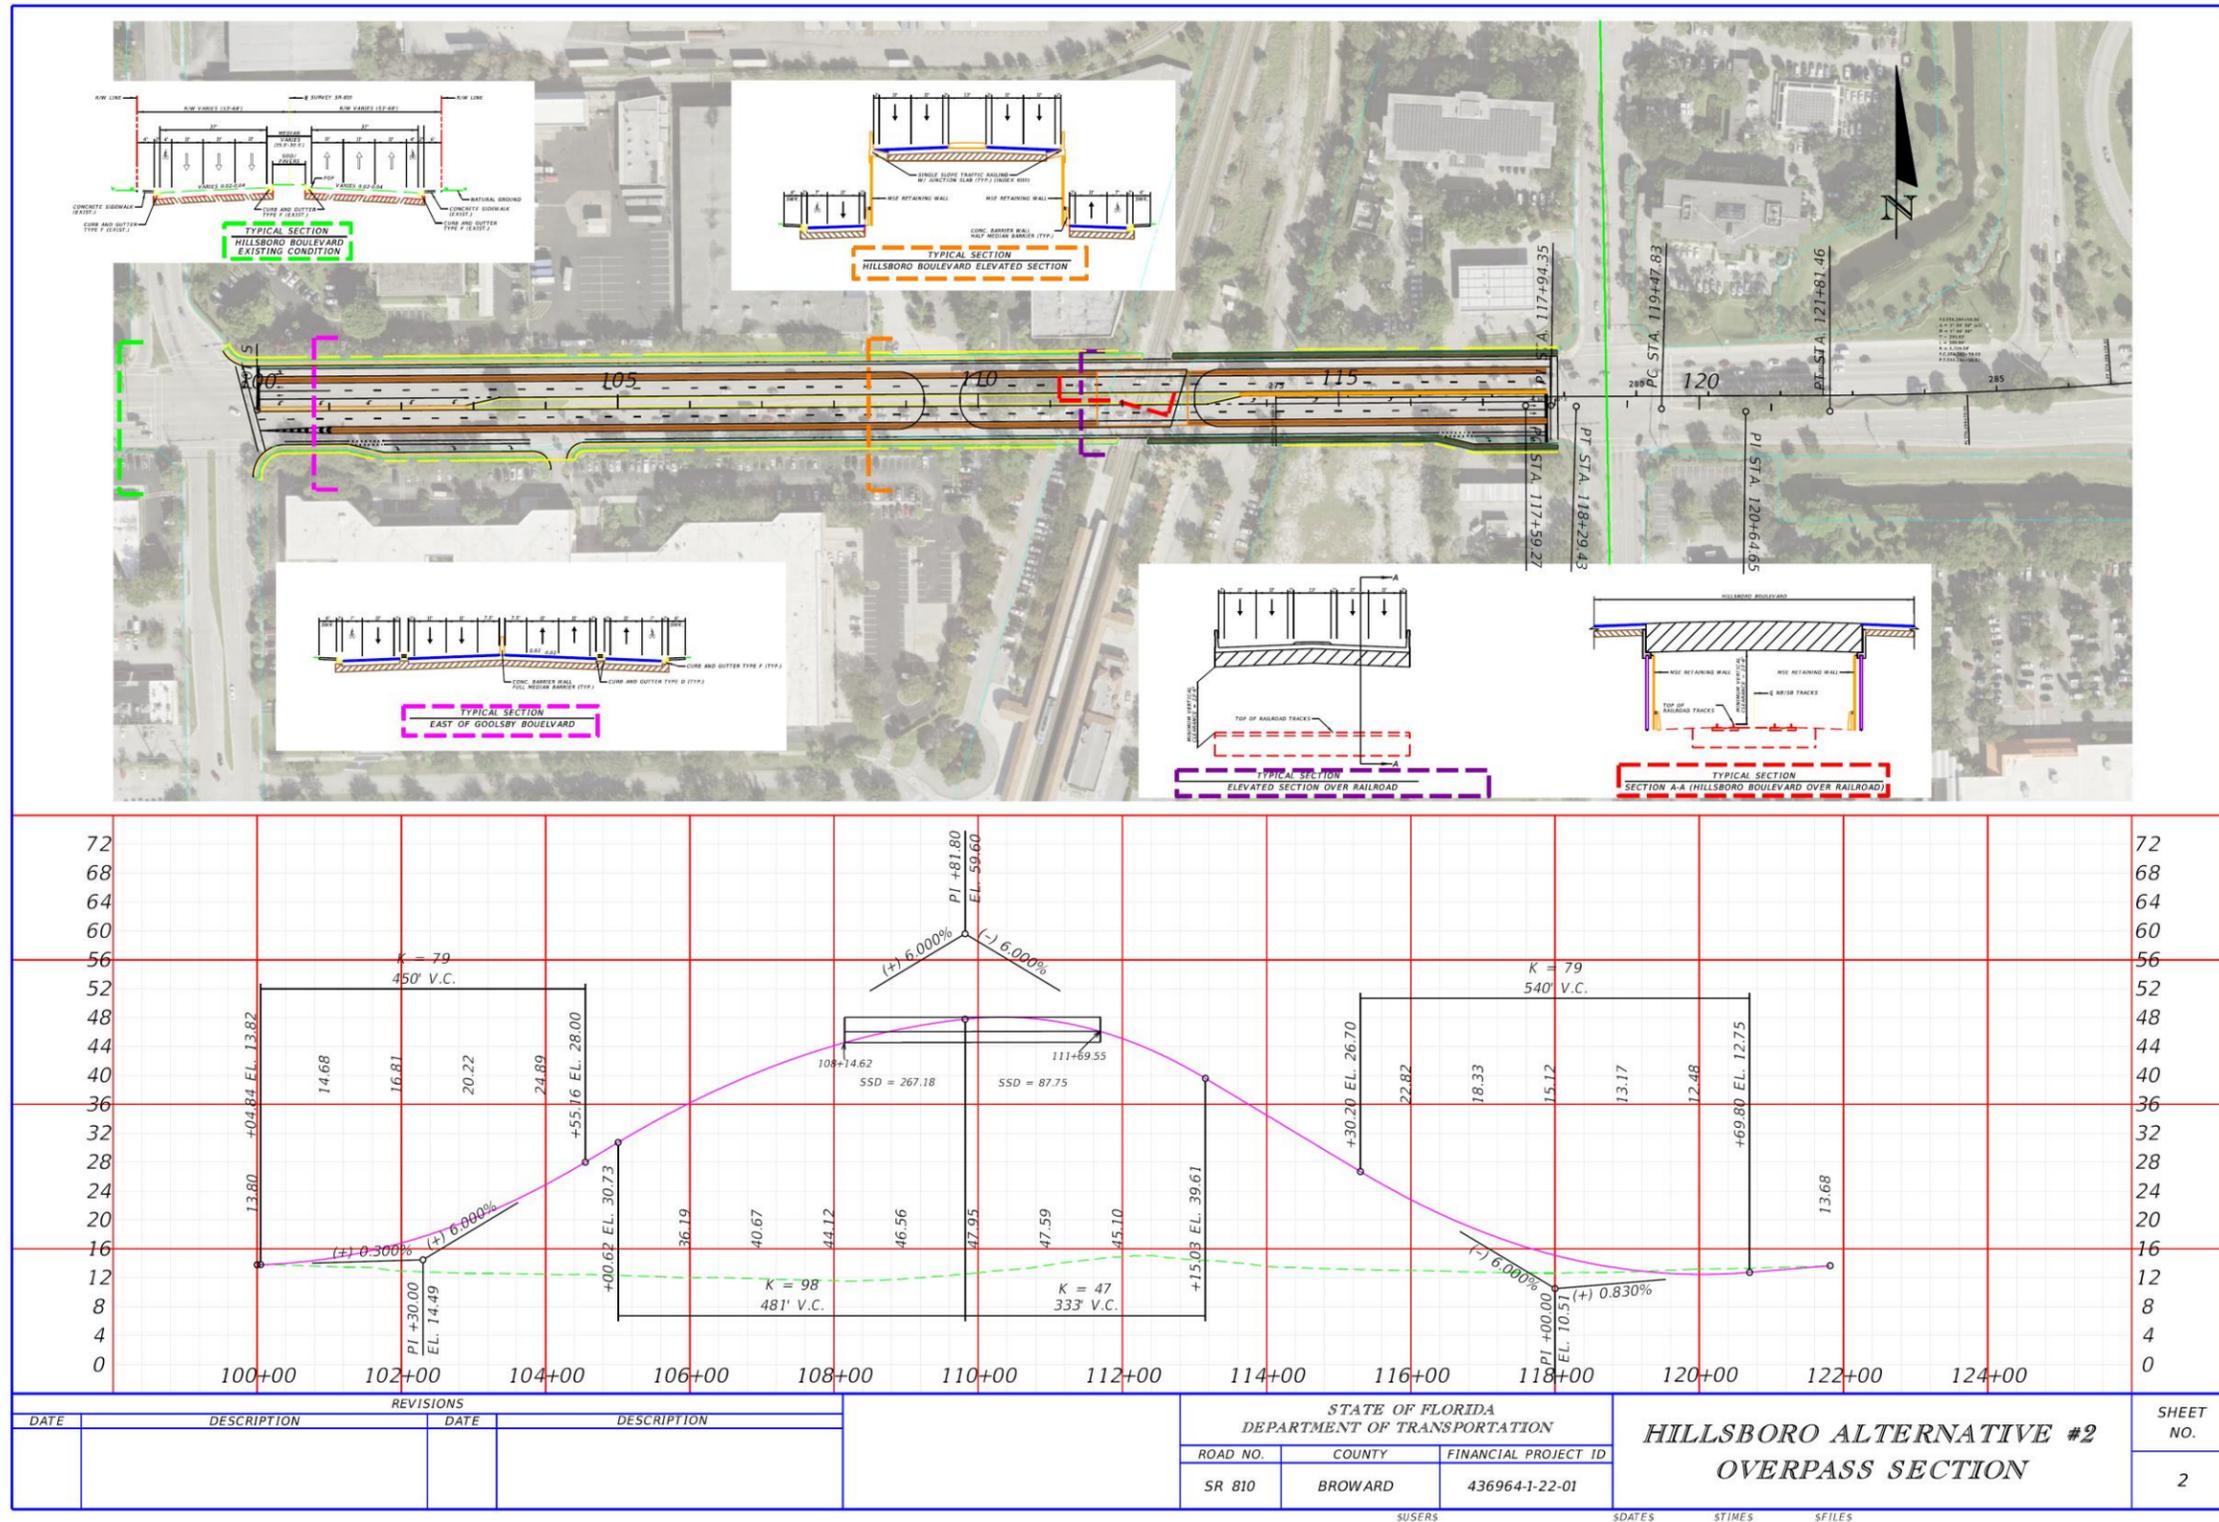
Hillsboro Boulevard – Concept Plan – Alternative 2
